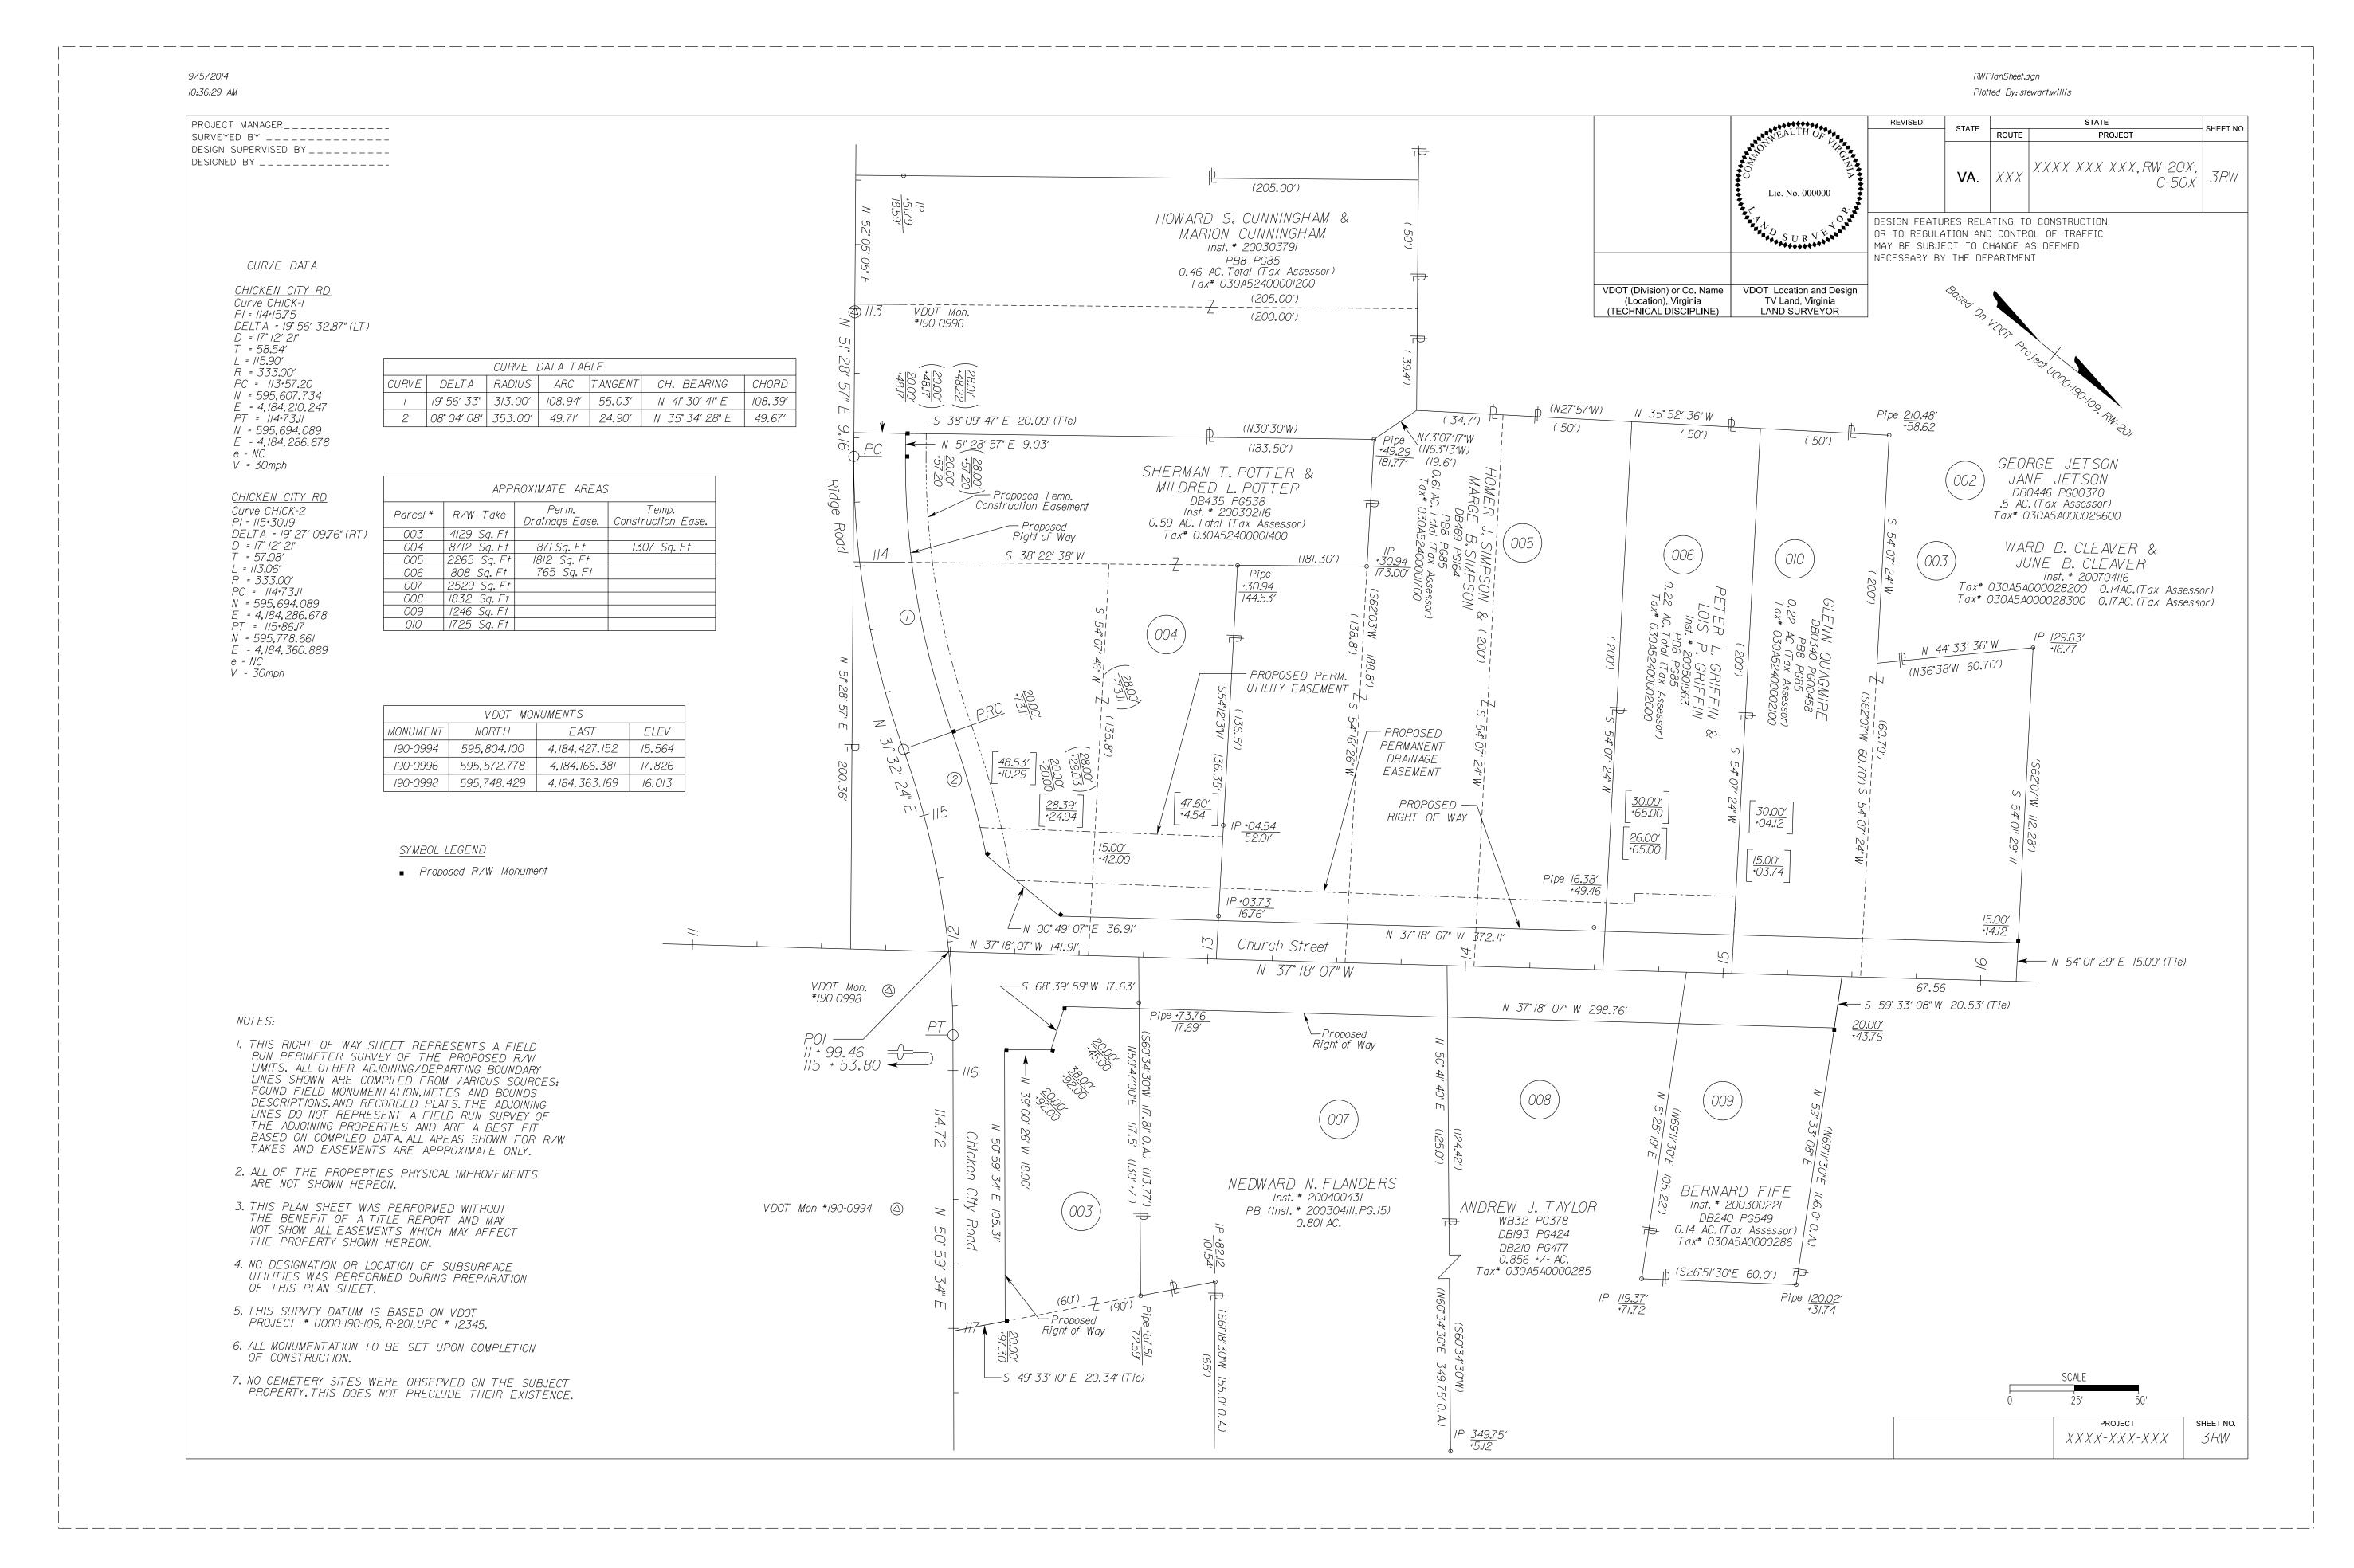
H - 39 SAMPLE RIGHT OF WAY PLAN SHEET
